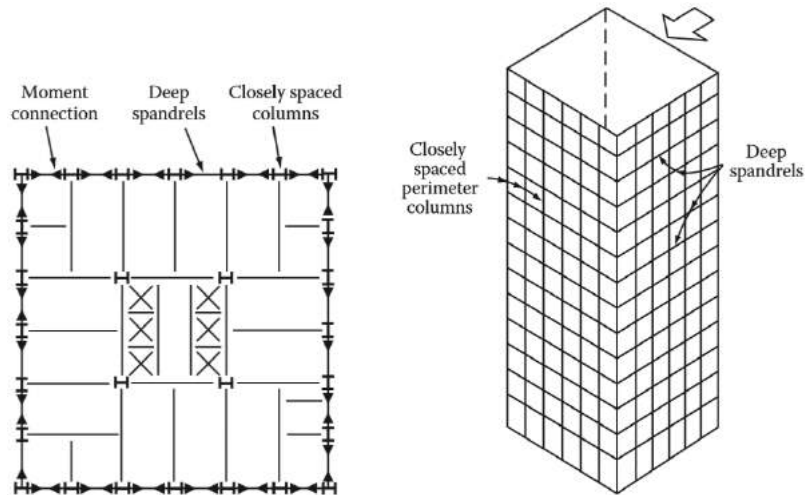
Plan and 3D View of Framed-Tube Structure Building
